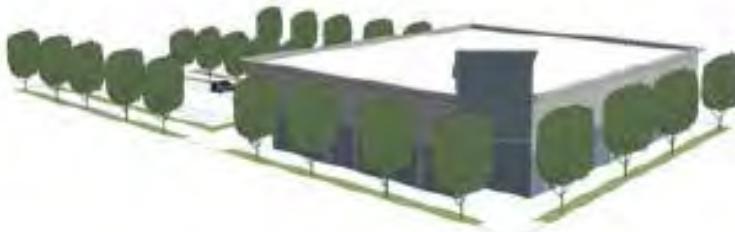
Low-Rise Mixed-Use Office Over Street-Oriented Commercial Building
